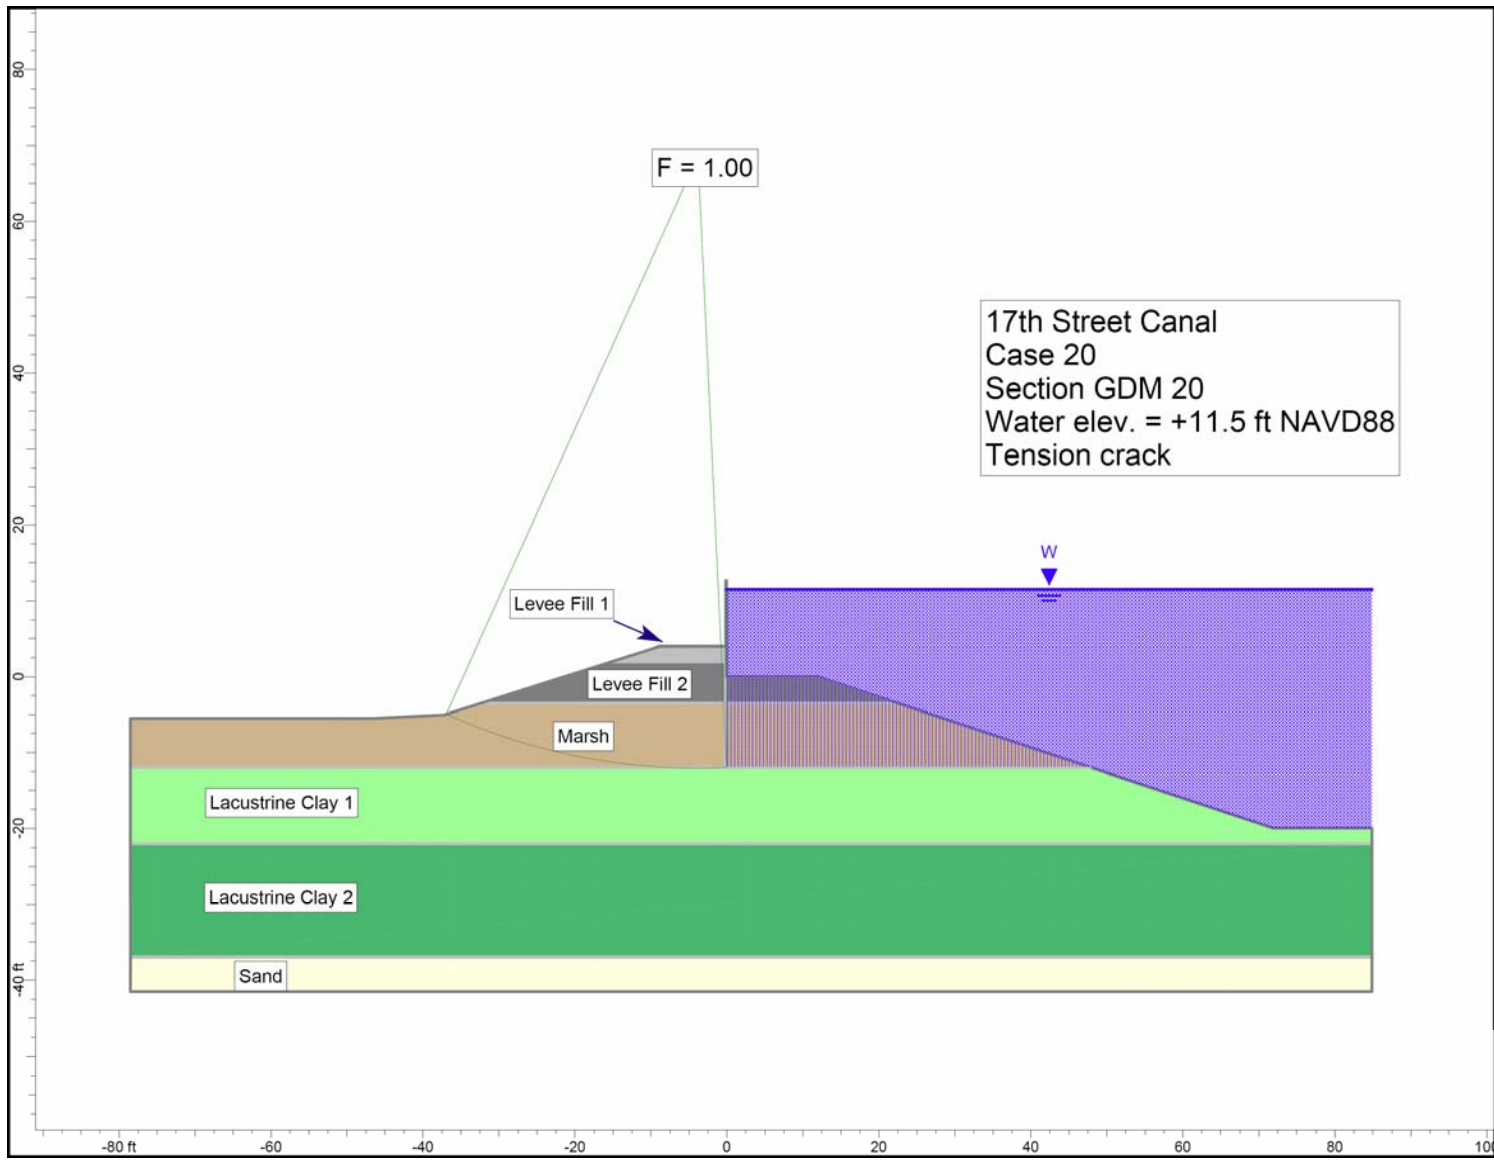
Critical Circle for 17th Street Canal Design Cross Section – Water Elevation 11.5 ft, Tension Crack
